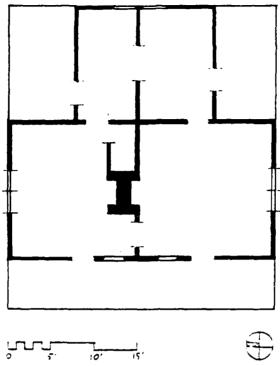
Plan of a frame saddlebag house, c. 1920, evolved from an earlier dogtrot house. Bay Springs Tract 710, Tishomingo County, Mississippi. HABS plan.
